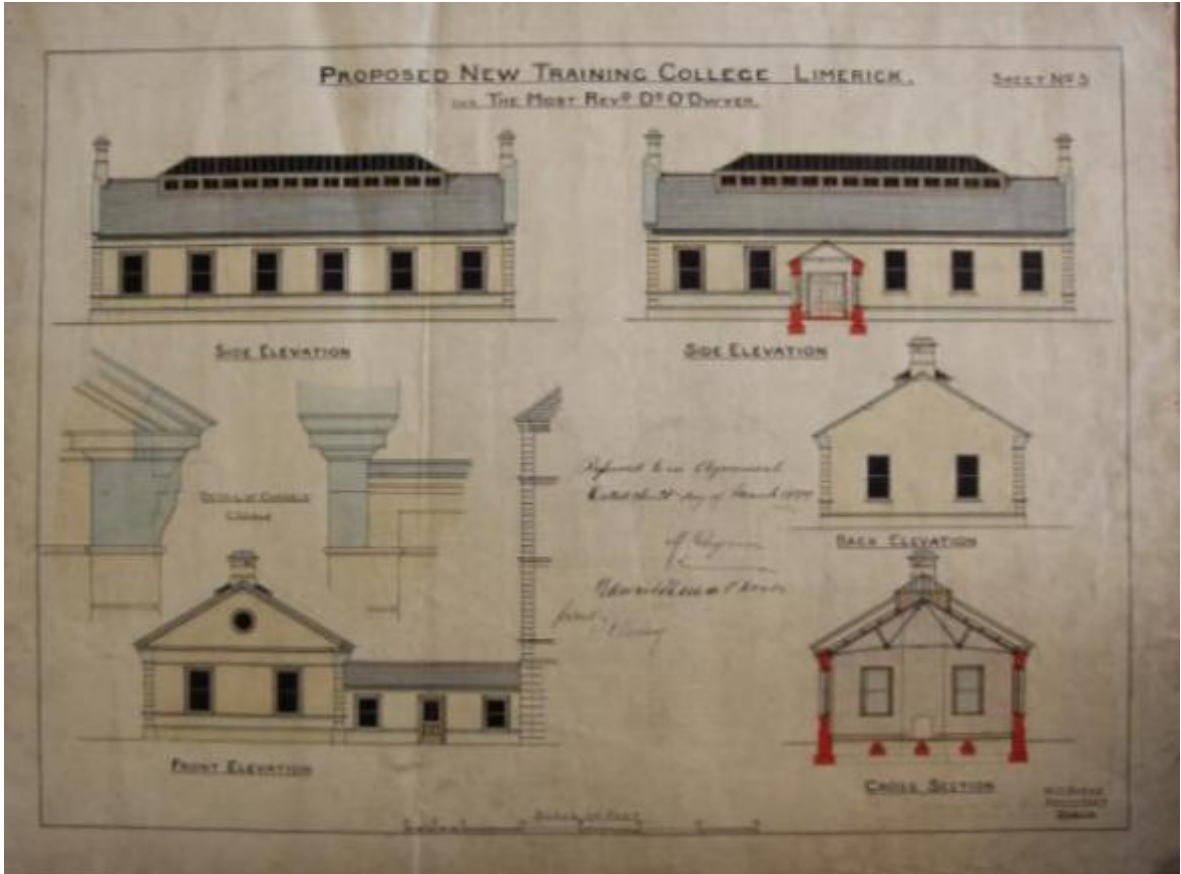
Proposed Recreational Hall Drawings - William Henry Byrne - Irish Architectural Archive
